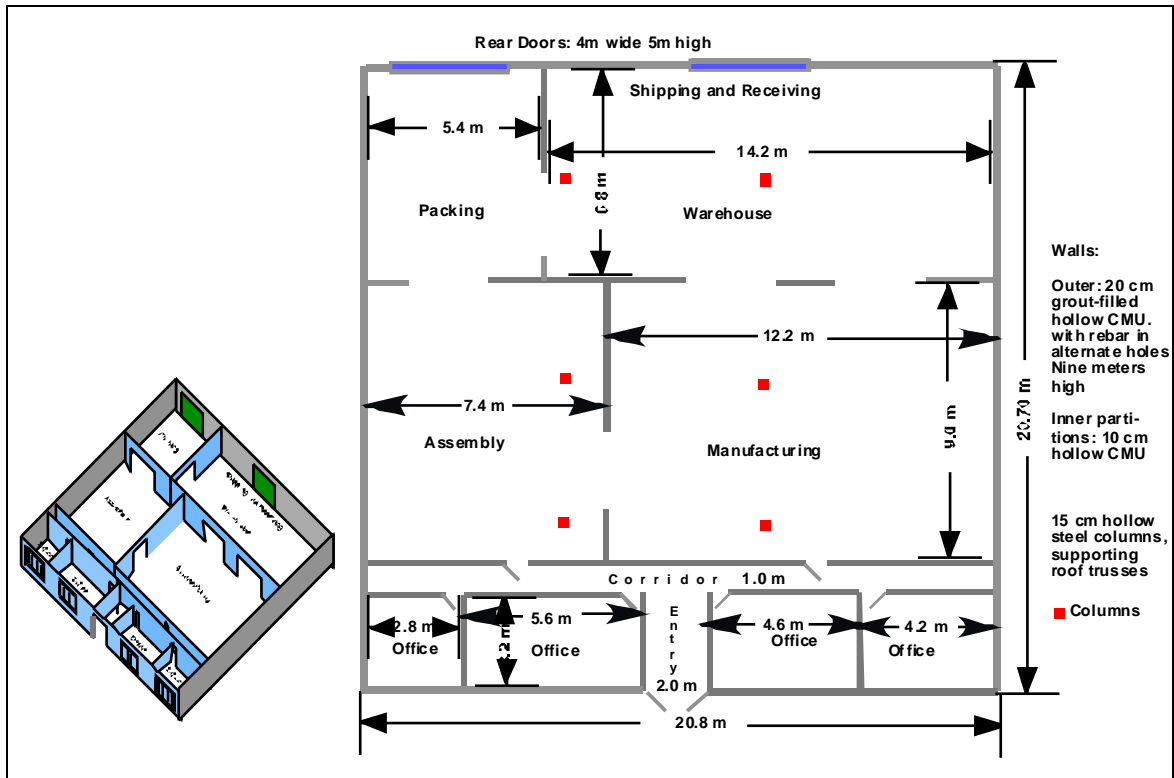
Planimetric floor plan and isometric rendering of an industrial/storage building.
